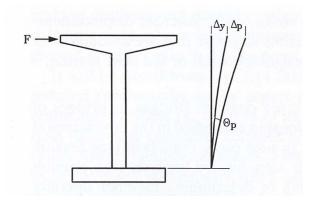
Displacement profile for a single bridge column (reprinted from Priestley et al.1996)
